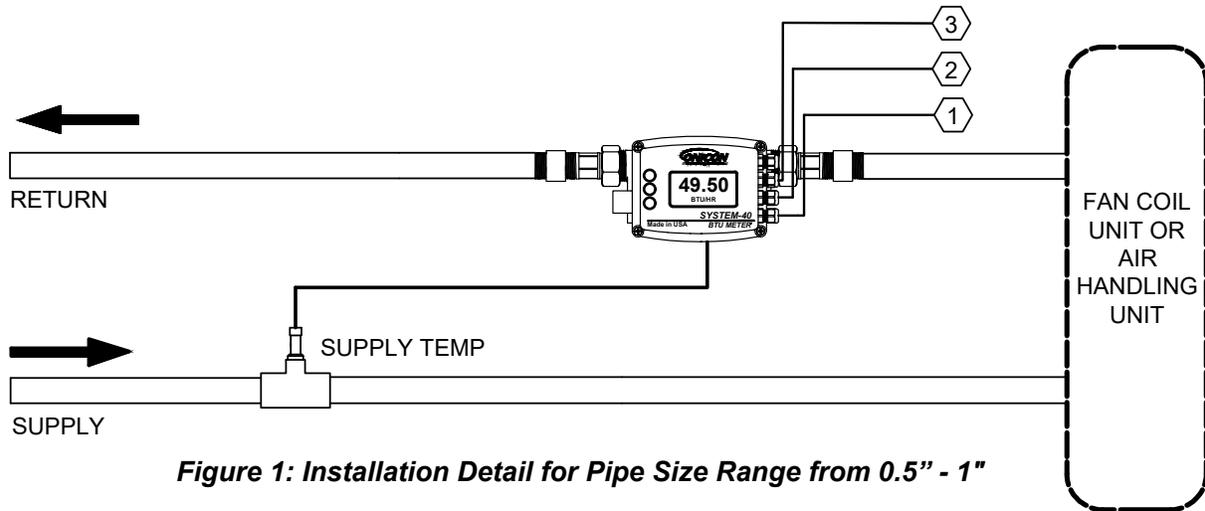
Installation Detail for Pipe Size Range from 0.5" - 1"
